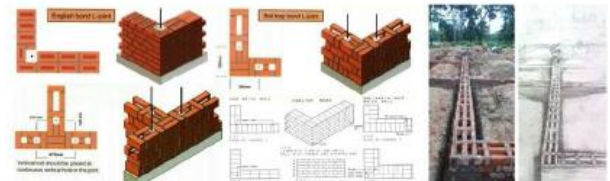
Rat Trap Foundation construction process [36] [18],curtesy-engineeringdiscoveries.com and Abdun Nime[1]
